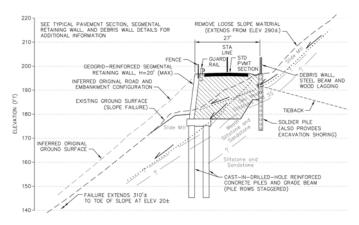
A. Conceptual design alternative for Station 176 showing geogrid-reinforced segmental retaining wall supported by cast-in-drilled-hole reinforced concrete piles and grade beam
